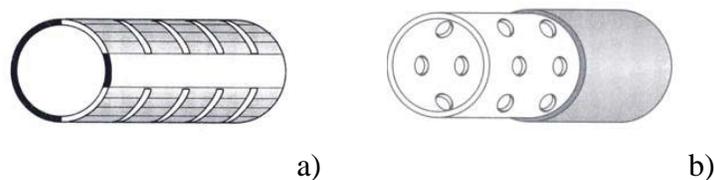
Example of drains used in boreholes: a) pipes with transversal slotting, b) perforated pipe covered by a geotextile.
